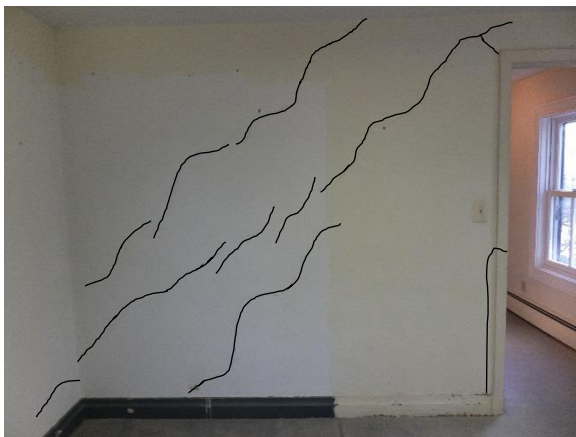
Diagonal cracking in room 202 (bedroom). Crack traced for clarity.
